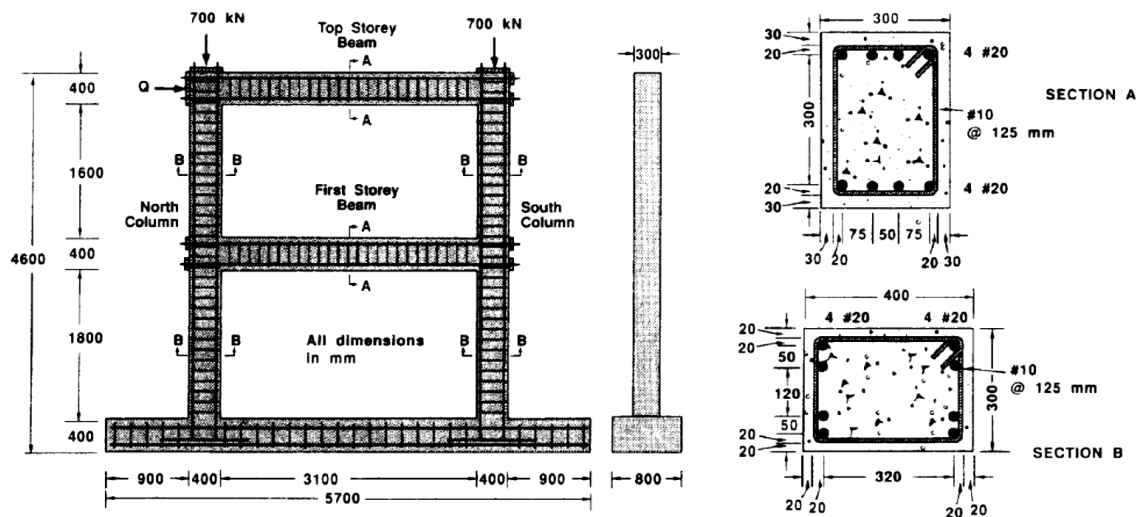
Elevation View and Section Properties of Frame Tested by Vecchio and Emara (1992)
